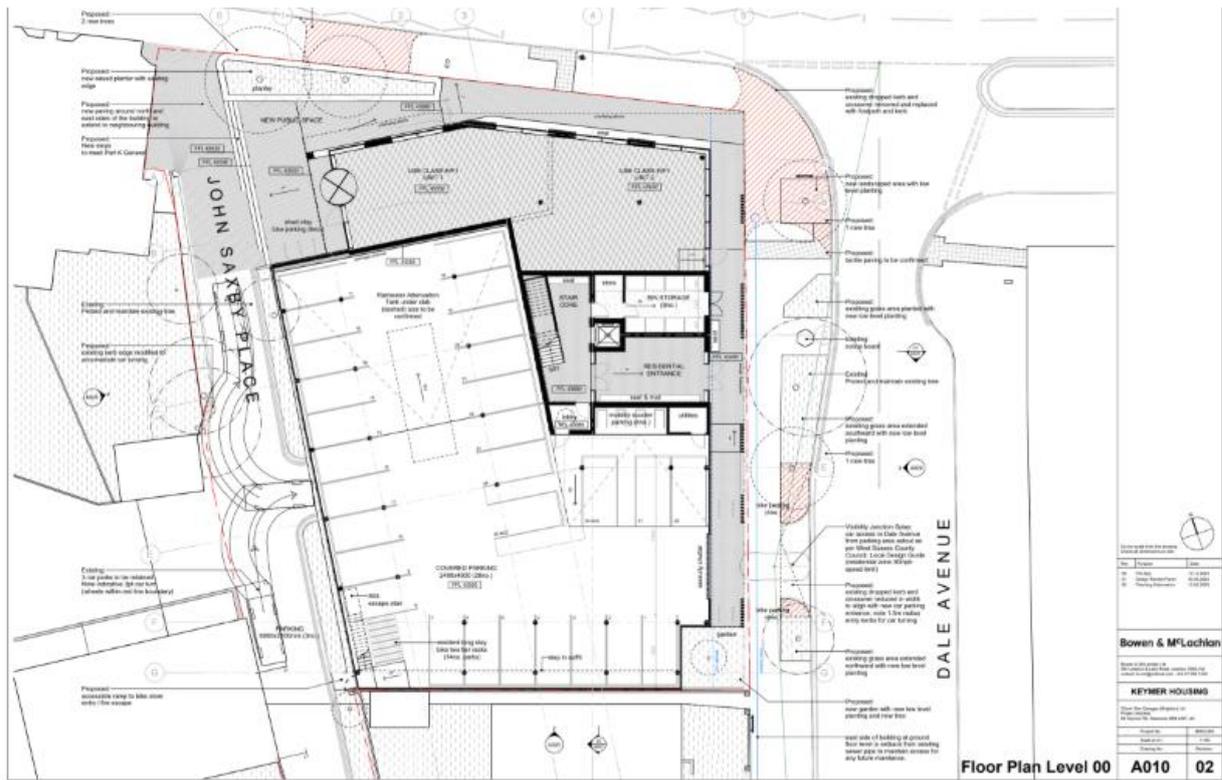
Proposed Site plan © Bowen and Mc.Lachlan Ltd drawing number A010 revision 02.
